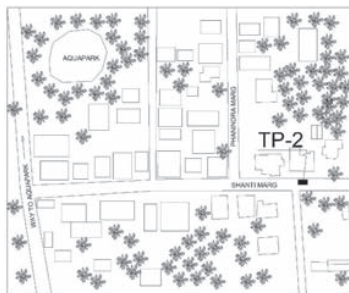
Tentative Site Plan of TP-2 (South of Aqua Park)
